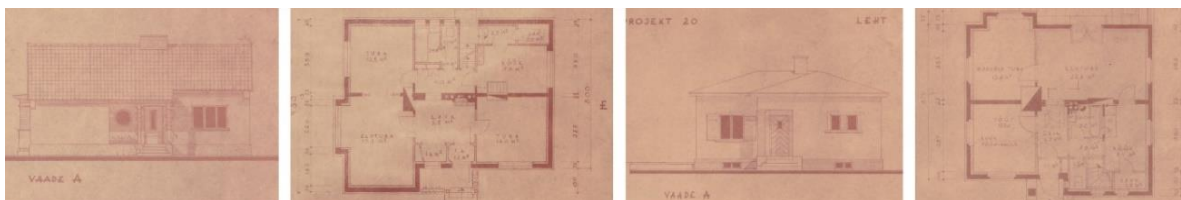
Examples of bungalow dwellings from 1954 (left to right: project 19 with elevation and ground floor; project 20 with elevation and ground floor) (VPI Estonprojekt, 1954)
